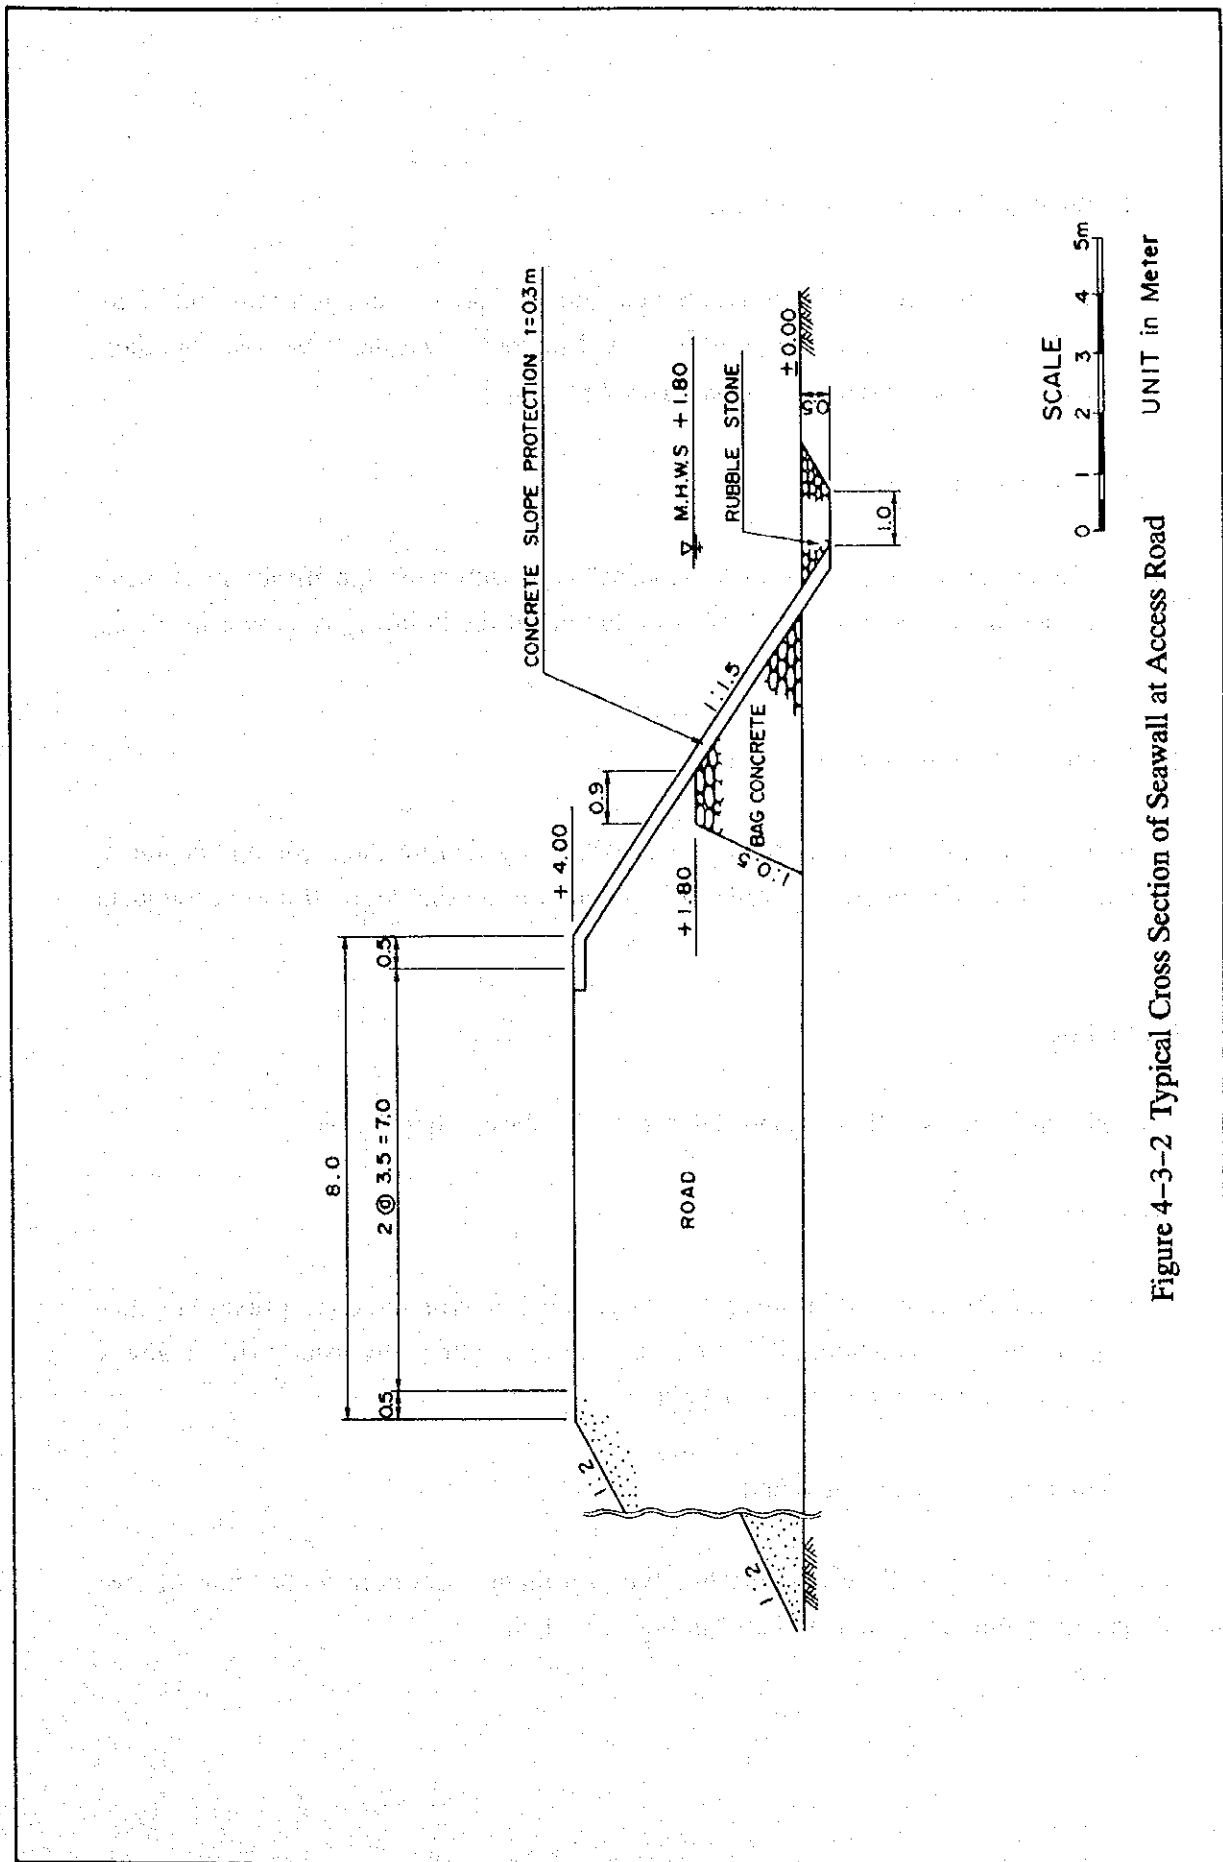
Typical Cross Section of Seawall at Access Road
